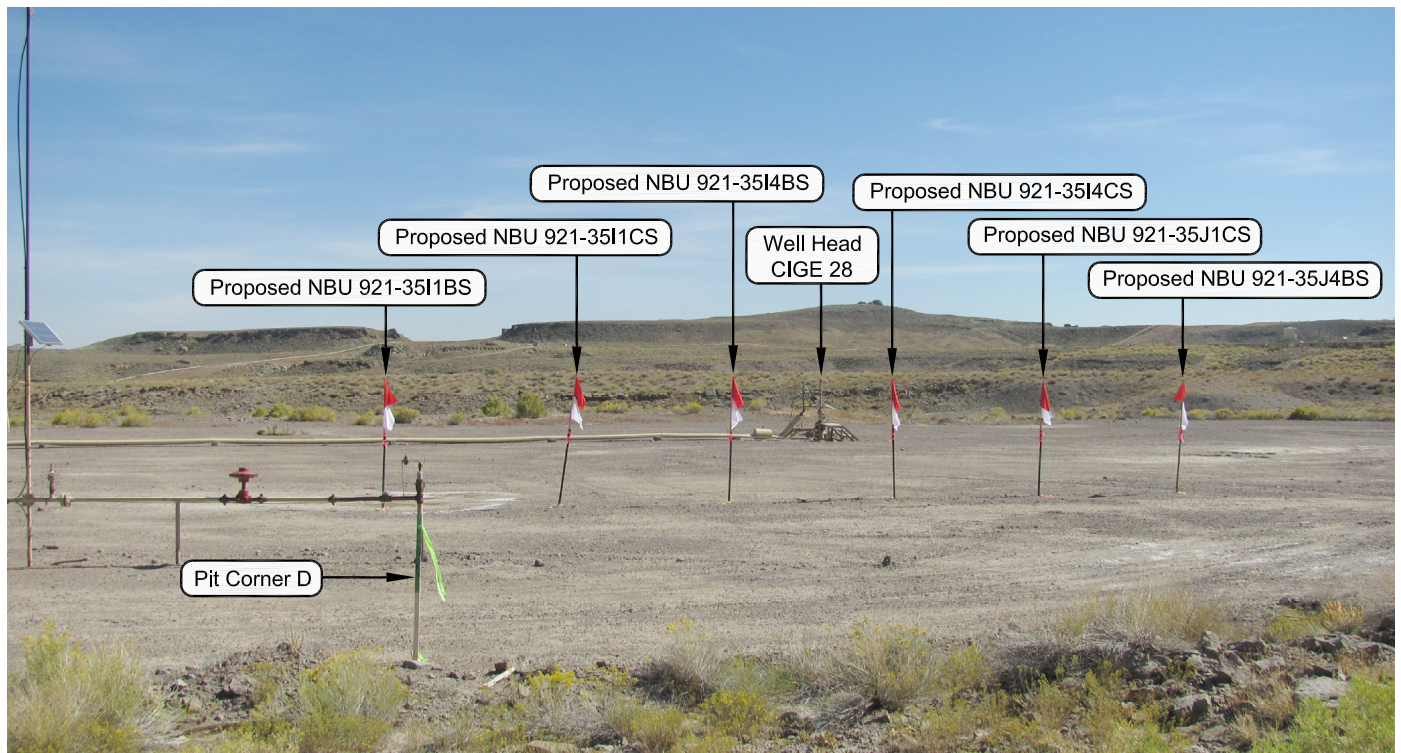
PHOTO VIEW: FROM PIT CORNER D TO LOCATION STAKE
